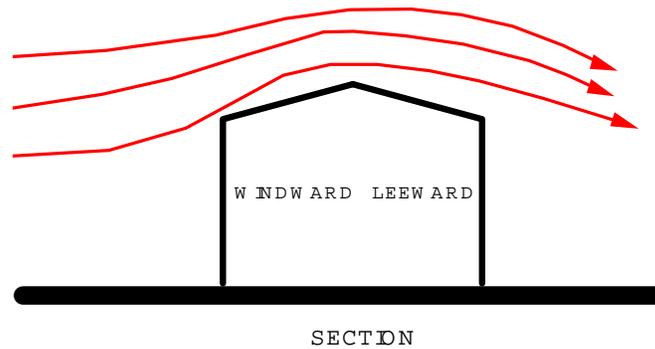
Wind Flow Over Simple Building with Gable Roof
